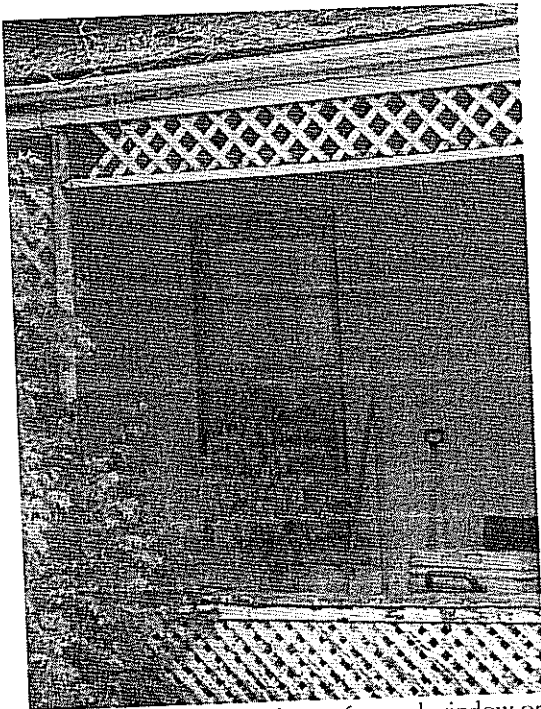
View of the 6 over 6 paned window on the Arthur Street elevation
